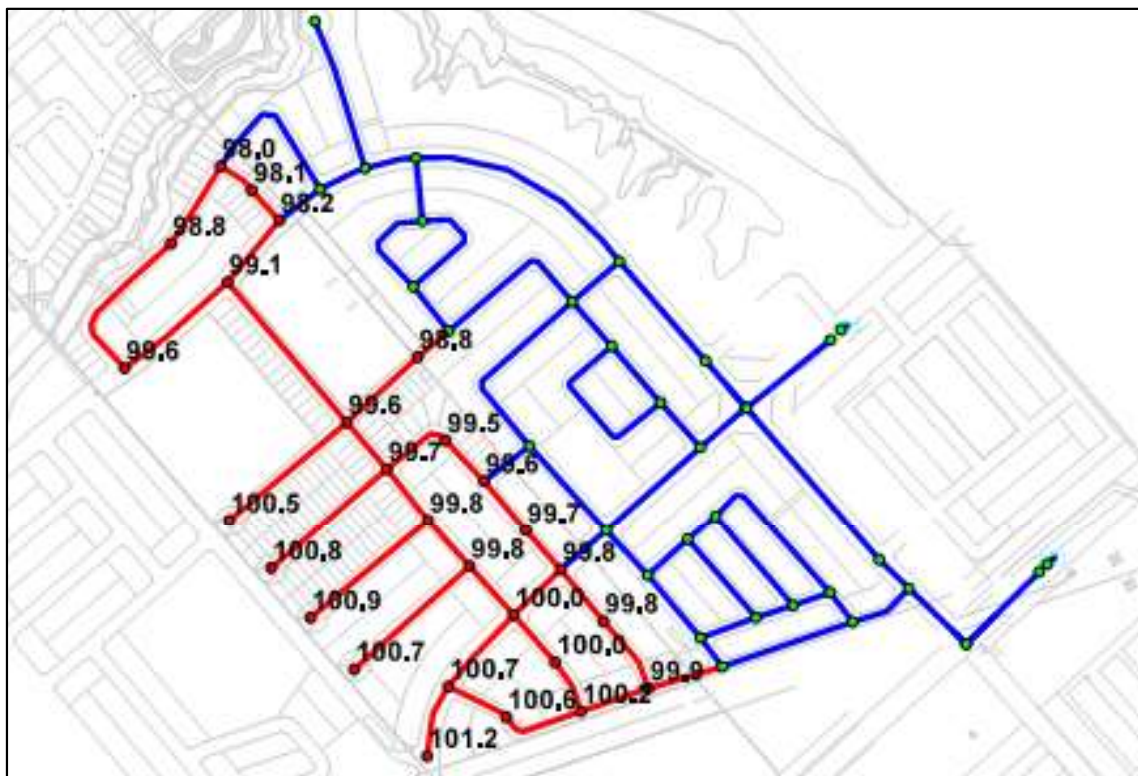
Ground Elevation of the Proposed Phase 1 Site (in meters)
